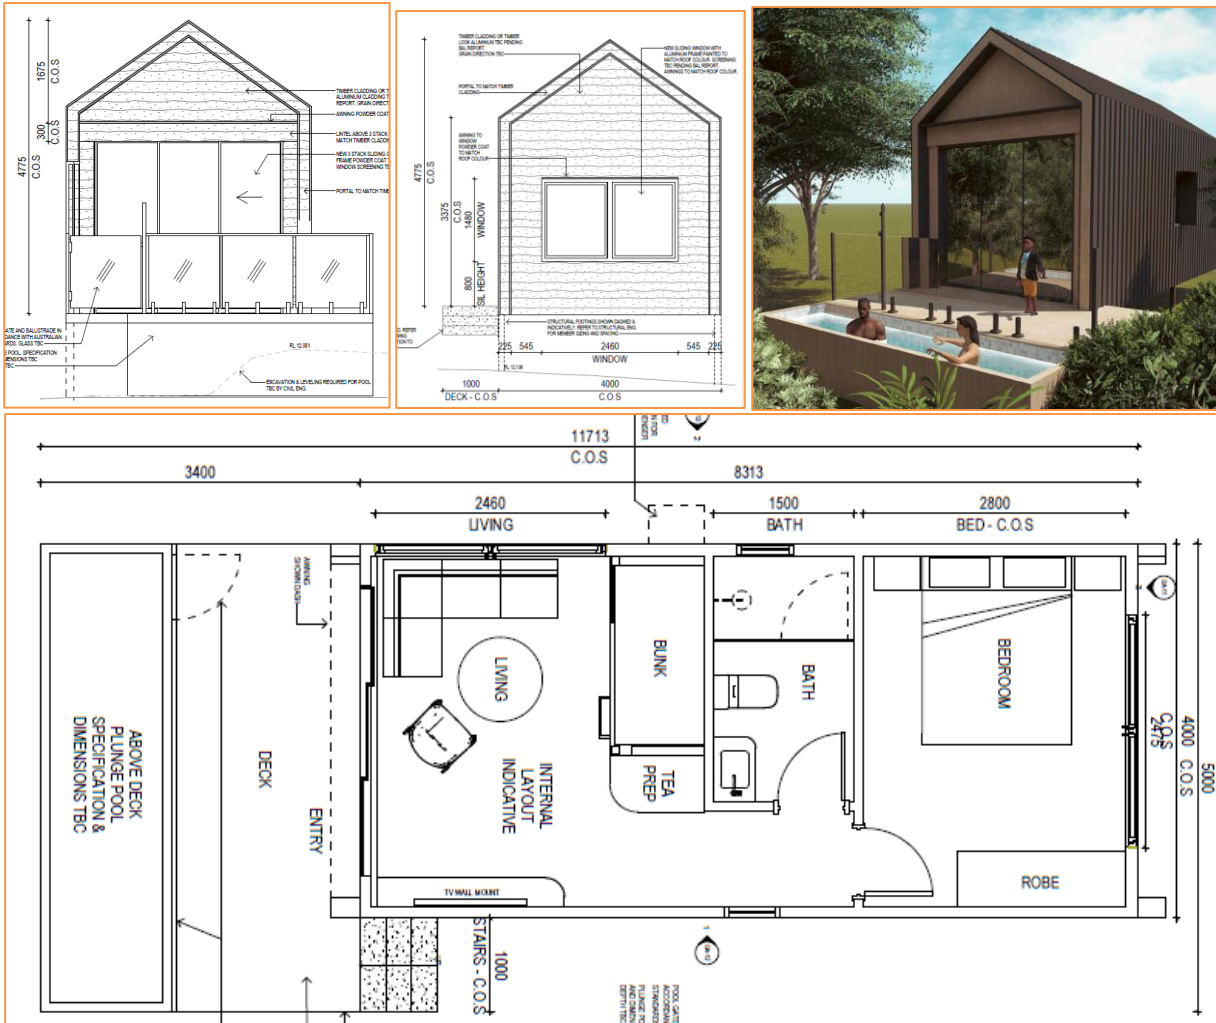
Typical Ensuite Accommodation – Floor Plan and Front and Rear Elevations
